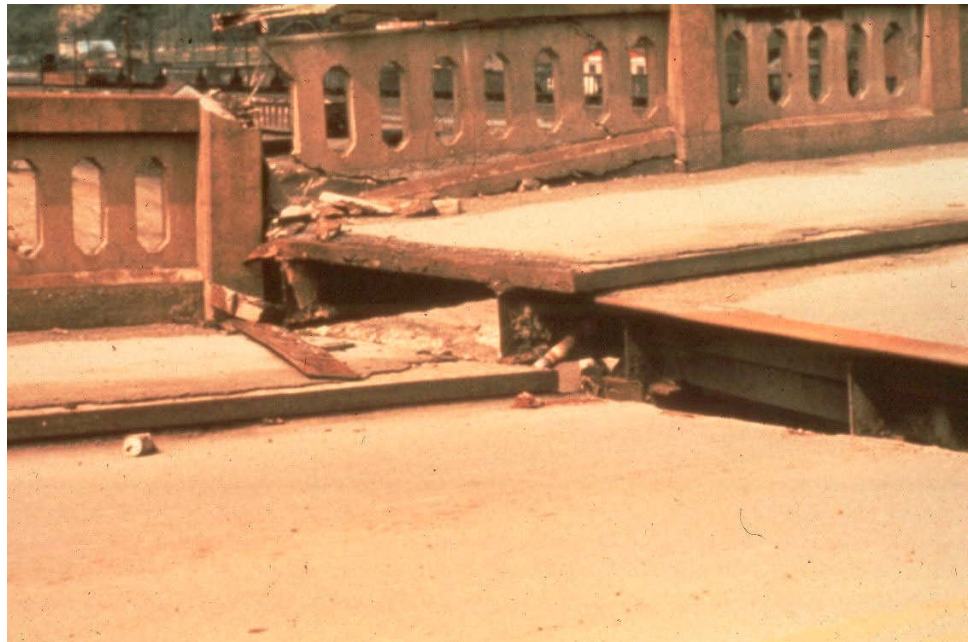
Superstructure Evidence of Pier Settlement
